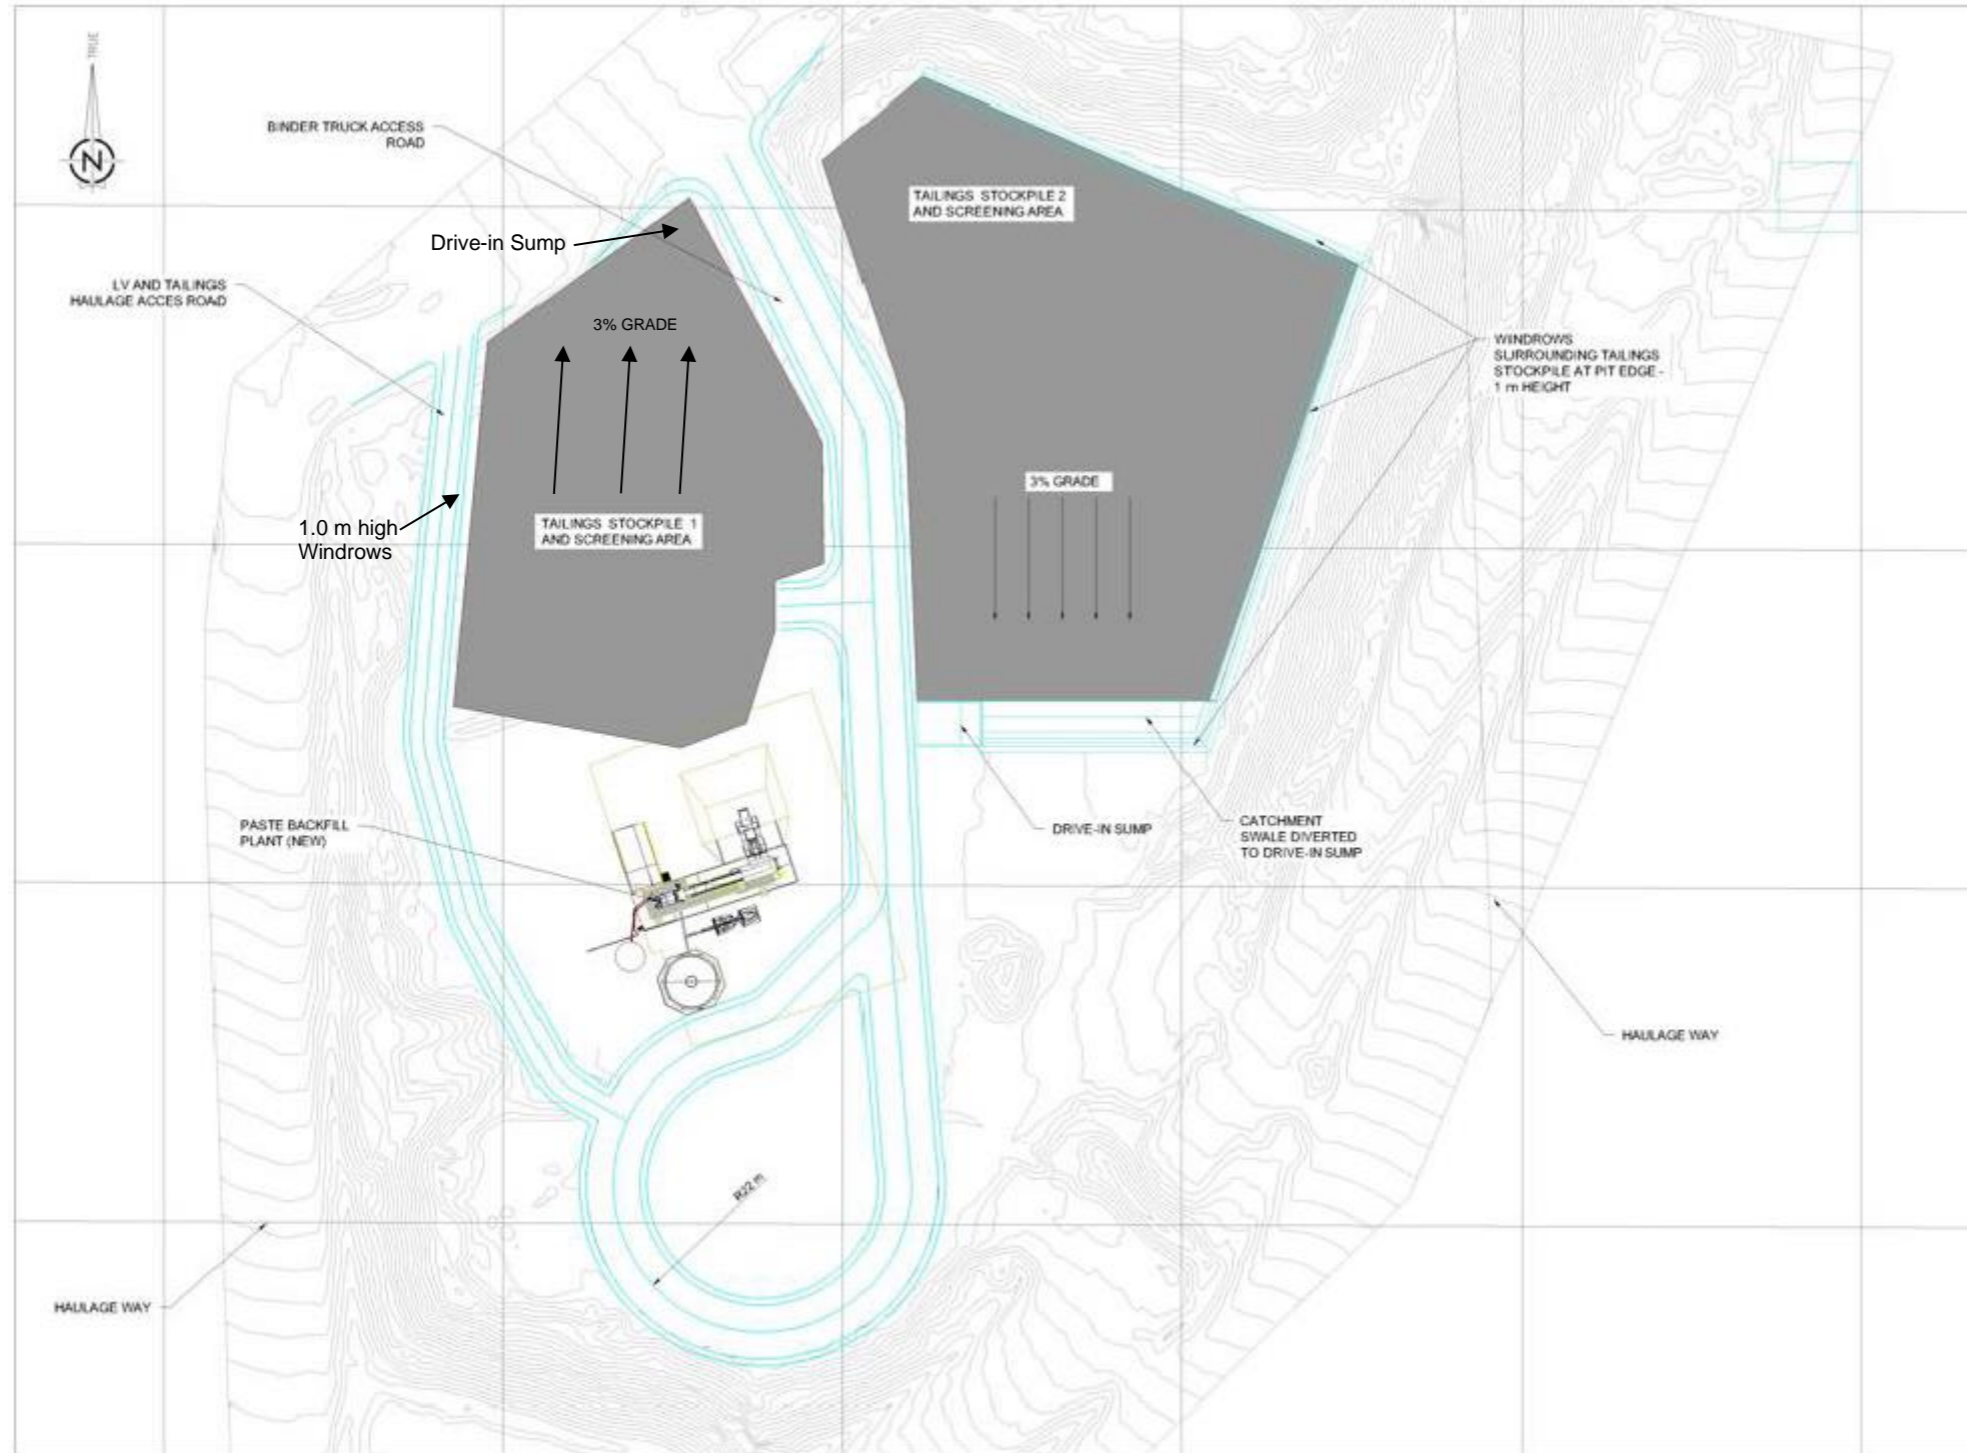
Reclaimed Tailings Stockpile and Paste Plant Layout
